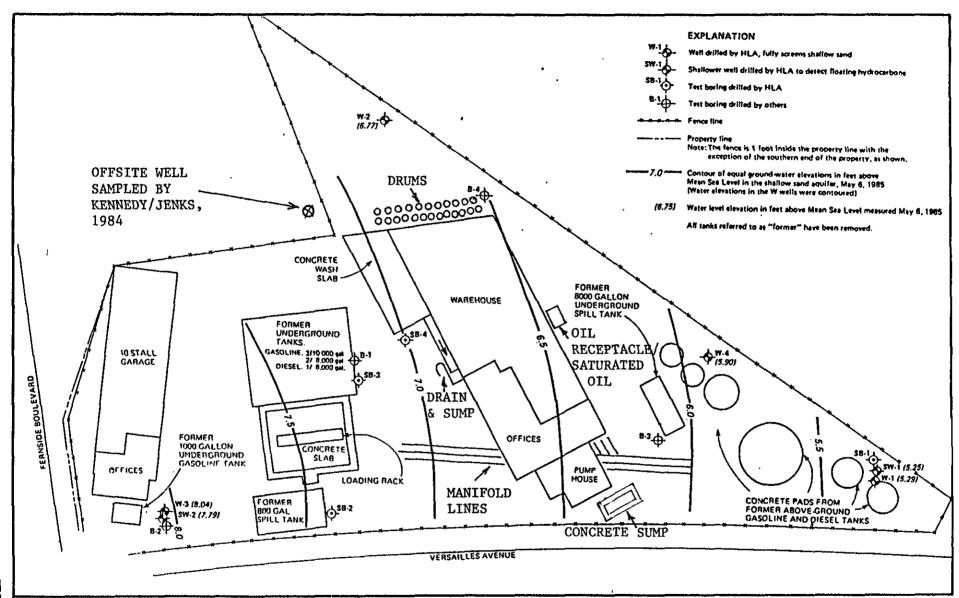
SITE PLAN SHOWING PREVIOUS EXPLORATORY DRILLING LOCATIONS AND HISTORICAL PETROLEUM BALK STROAGE FACILITIES
